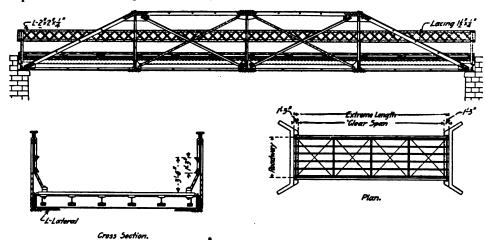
LOW PRATT RIVETED HIGHWAY BRIDGE. AMERICAN BRIDGE COMPANY.
